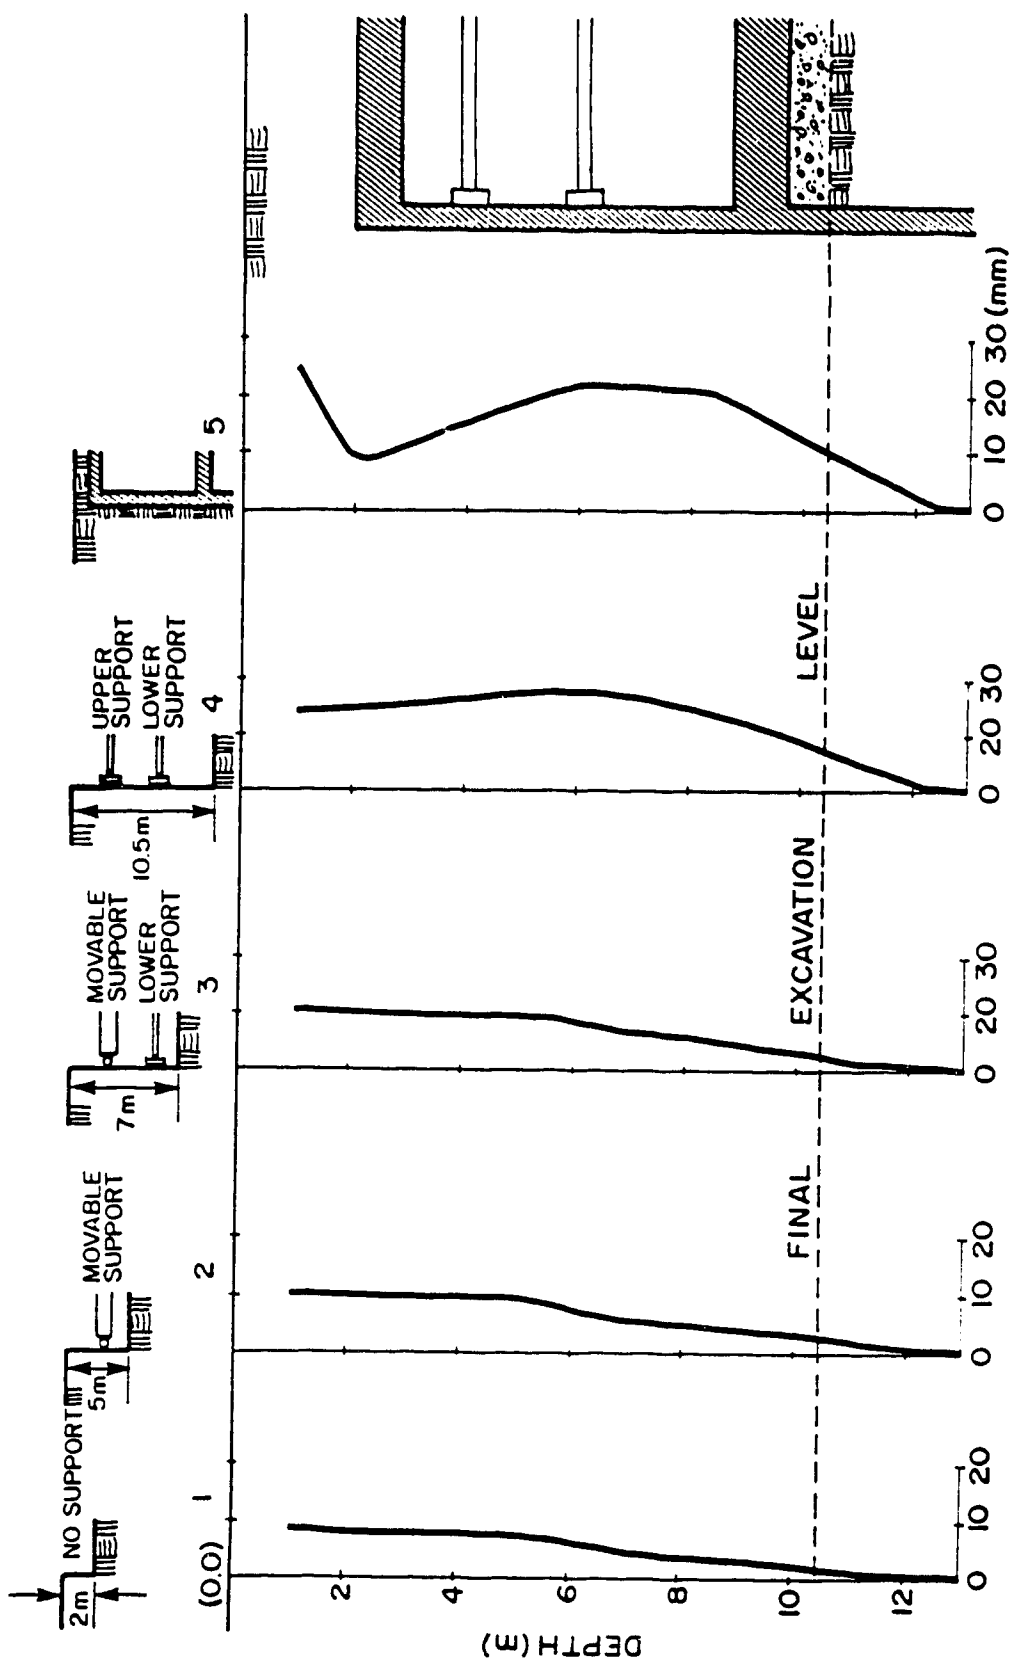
The Diaphragm Wall Lateral Displacement during Excavation at the Tunnel Test
